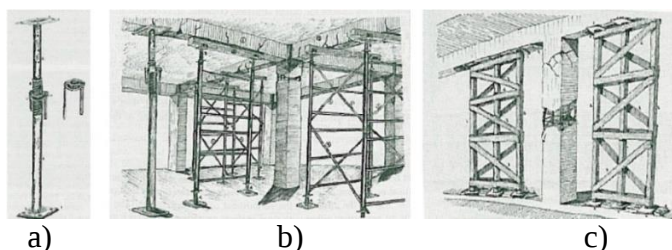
a) b) Scaffolding made of adjustable metal props (telescopic) and wooden beams;
